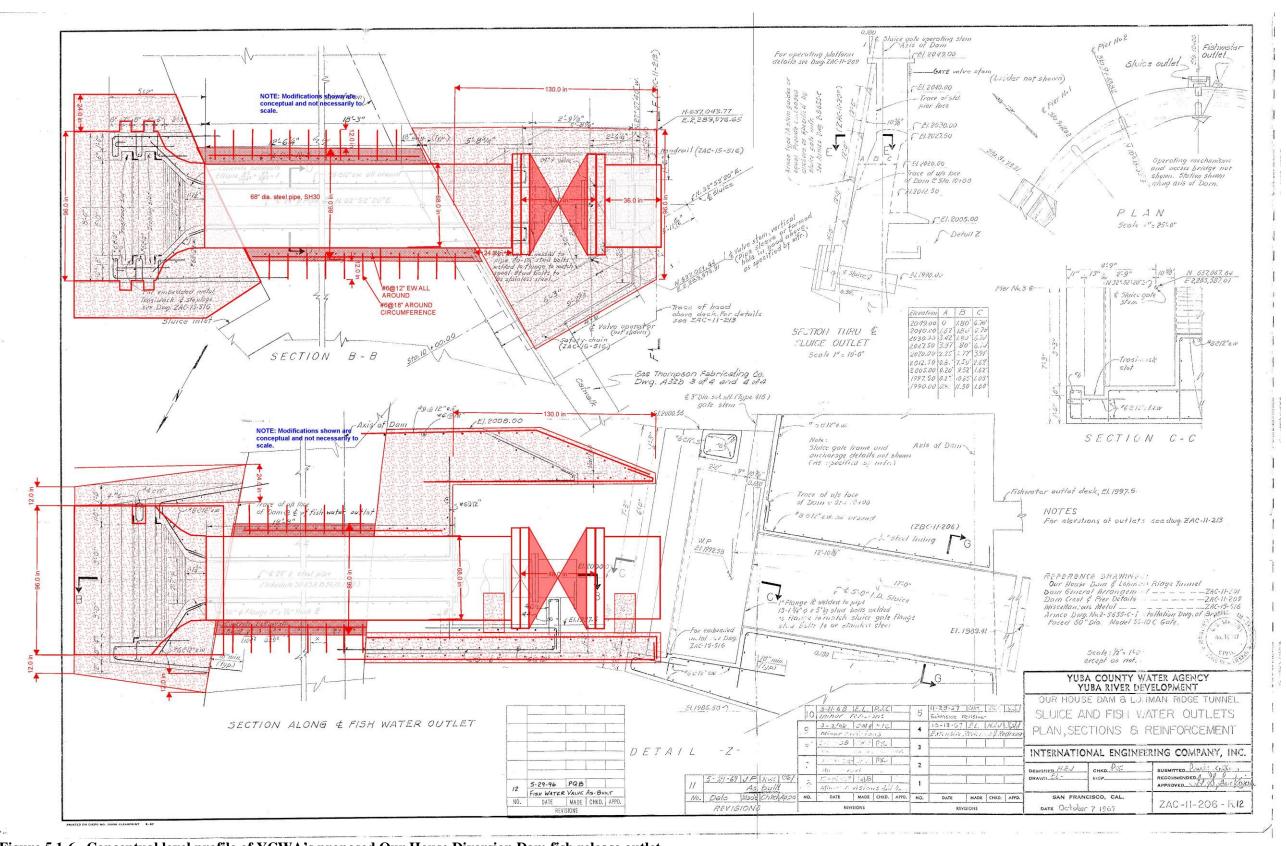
Conceptual level profile of YCWA's proposed Our House Diversion Dam fish release outlet.
